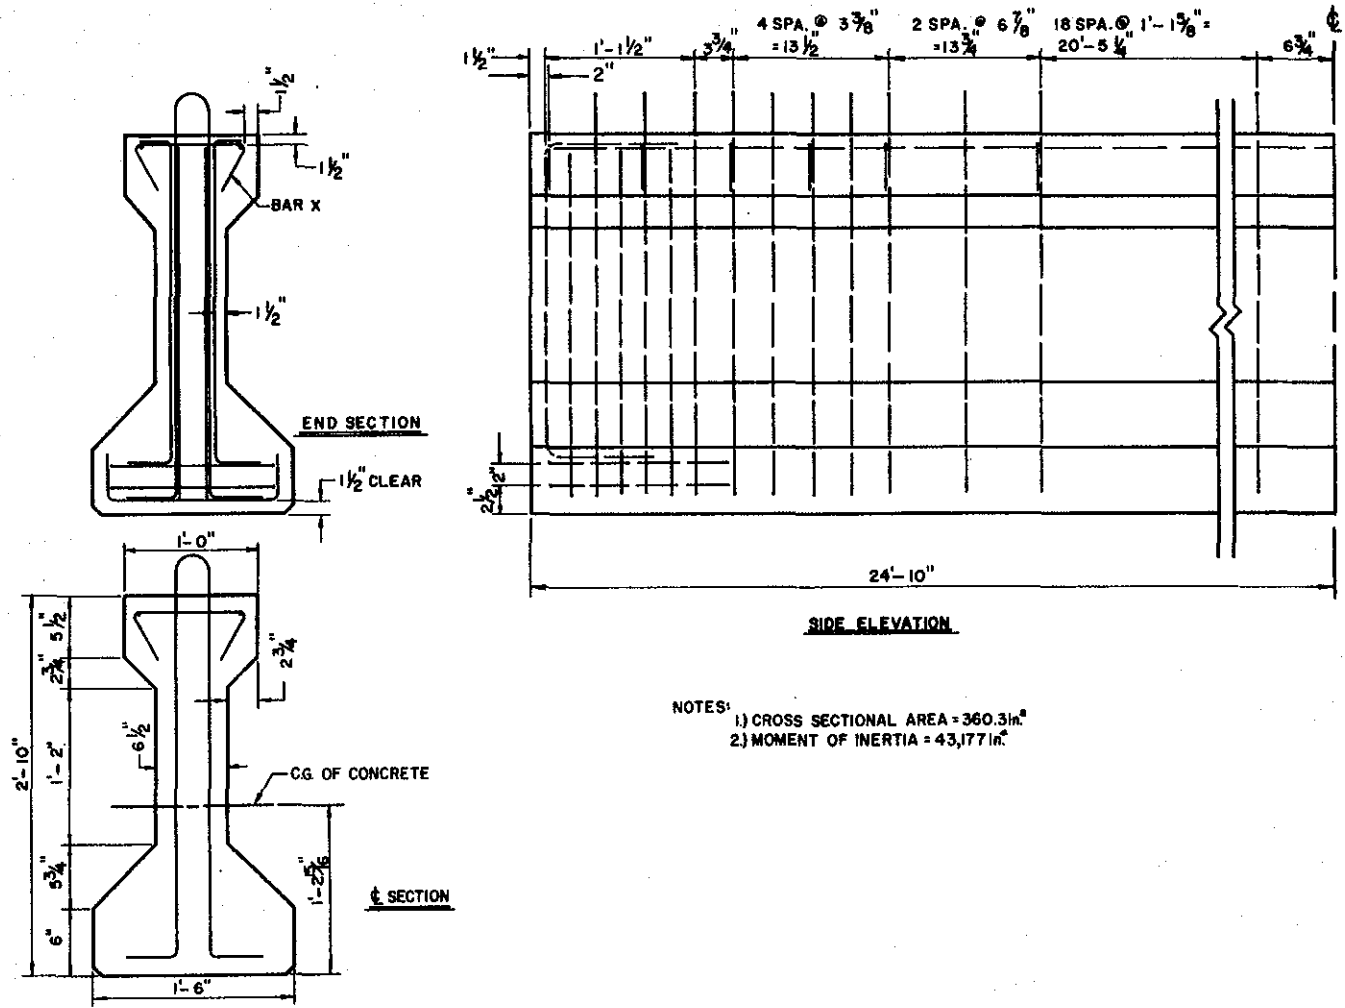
Properties of Beam Cross Section and Details of Conventional Reinforcement.
